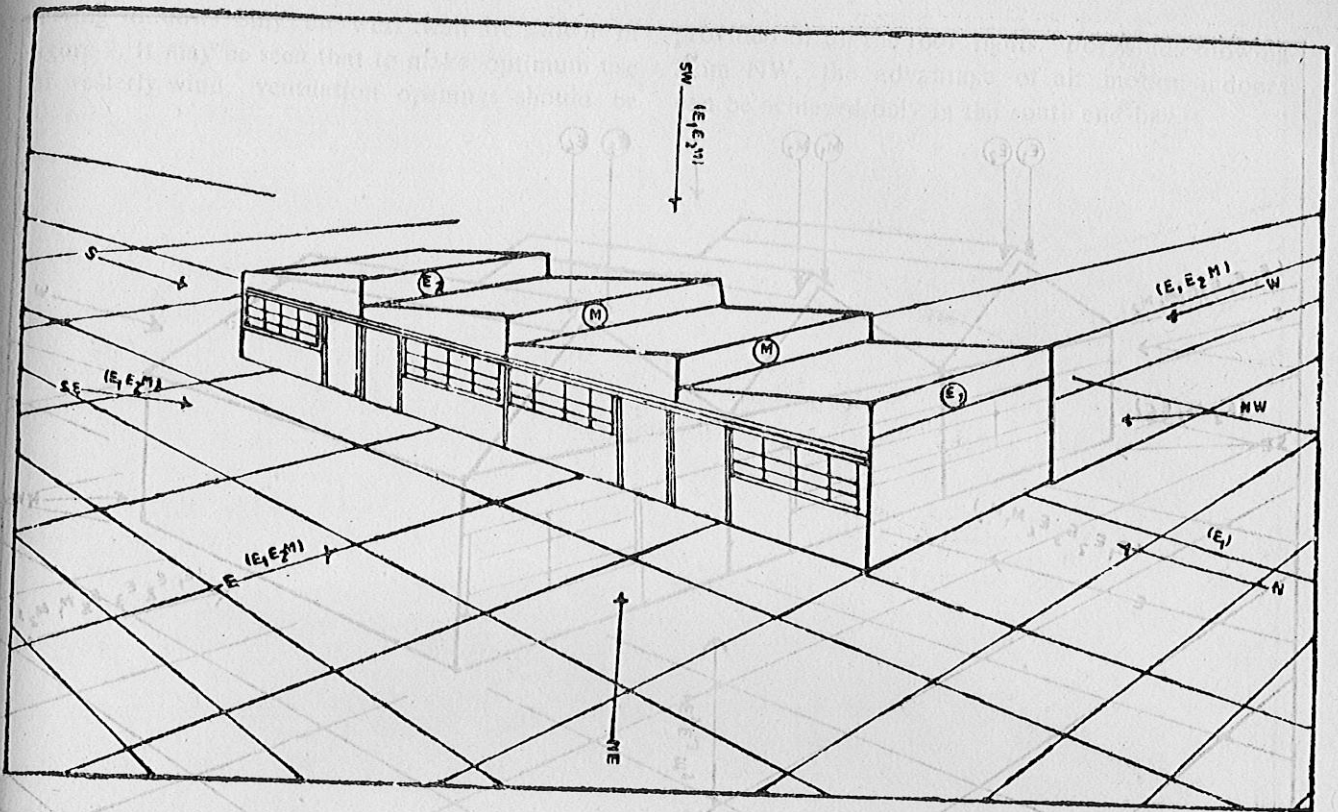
Preferred Location of Roof Openings in Northlight Sheds Having Windows on East & West Walls.
